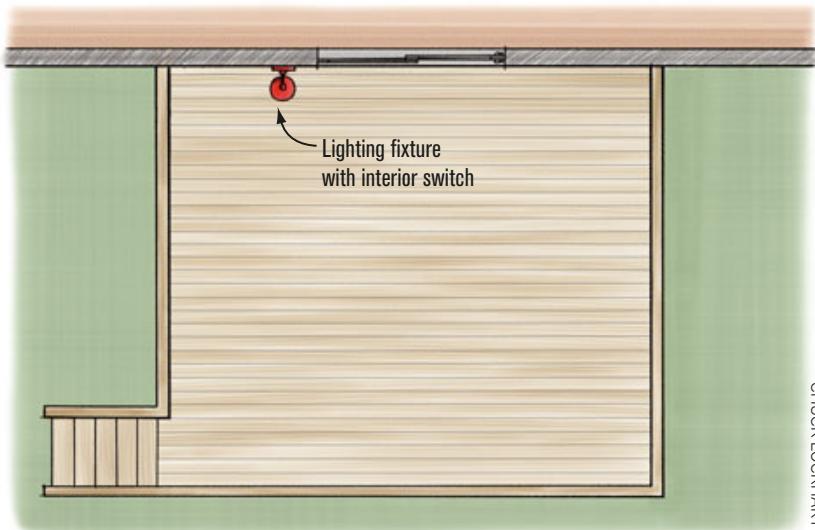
If a door is added as part of a deck project that has access to grade, or if adding a stairway to an existing deck creates access to grade, a light at the door and an interior switch are required.
